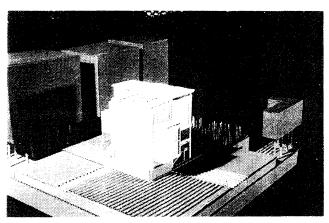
Design / development of structure and enclsure and site construction strategies.
